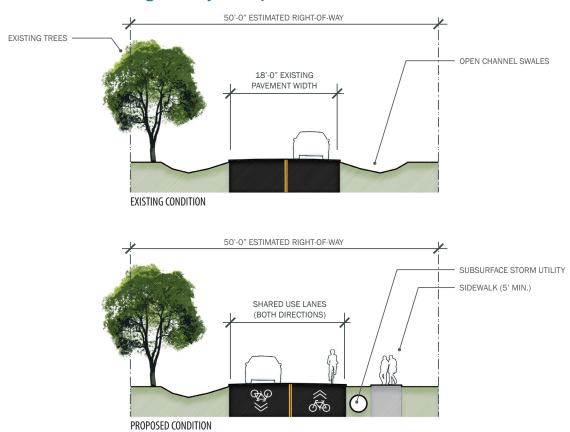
Cross-section study of existing and proposed conditions of typical corridor with 50' right-of-way
